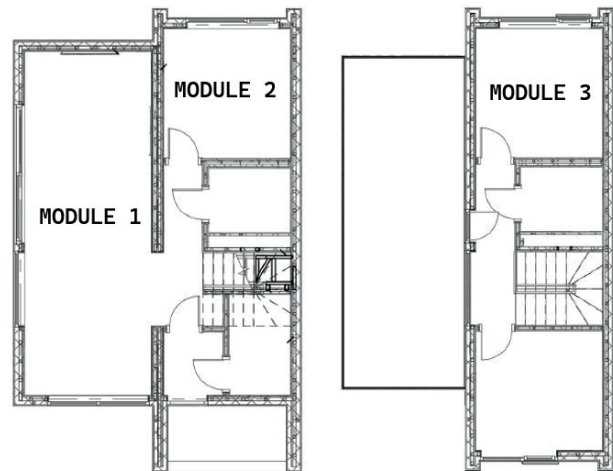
Floor plan of the modular building-ground floor and first floor-including the assigned module numbers
